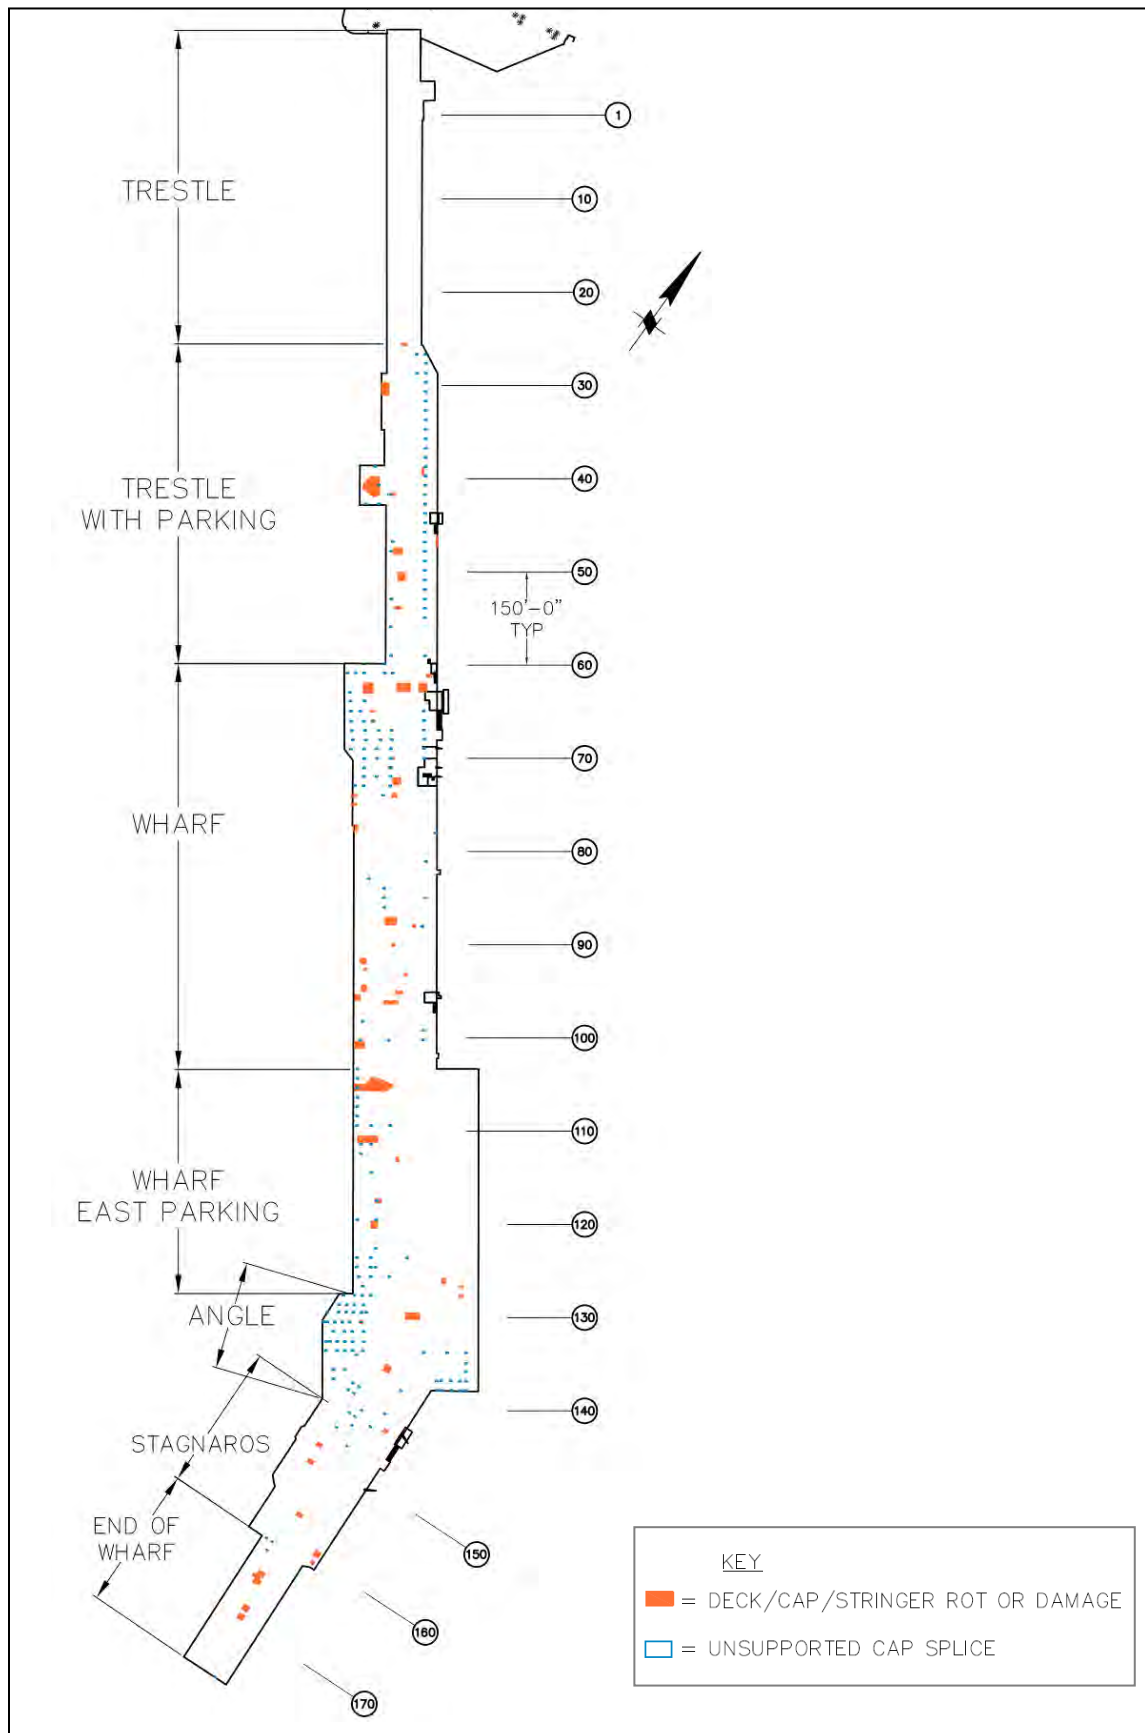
Structural Evaluation – Substructure Damage Plan
